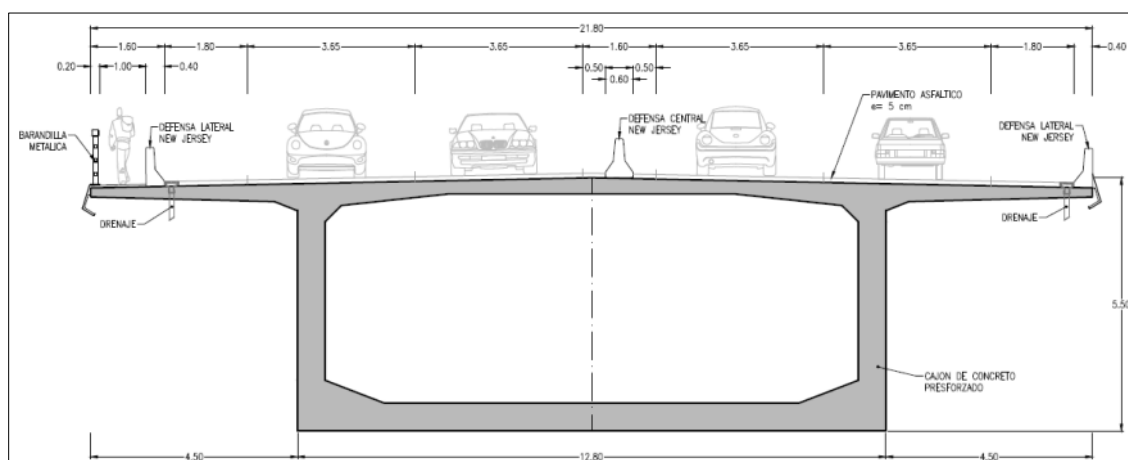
Elevation of the El Porvenir rural district Bridge.
